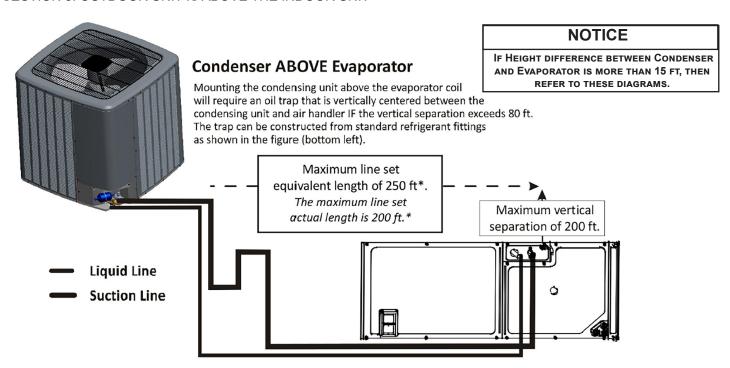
INSTALLATION OF REFRIGERANT PIPING (VERTICAL) NEW CONSTRUCTION SHOWN
